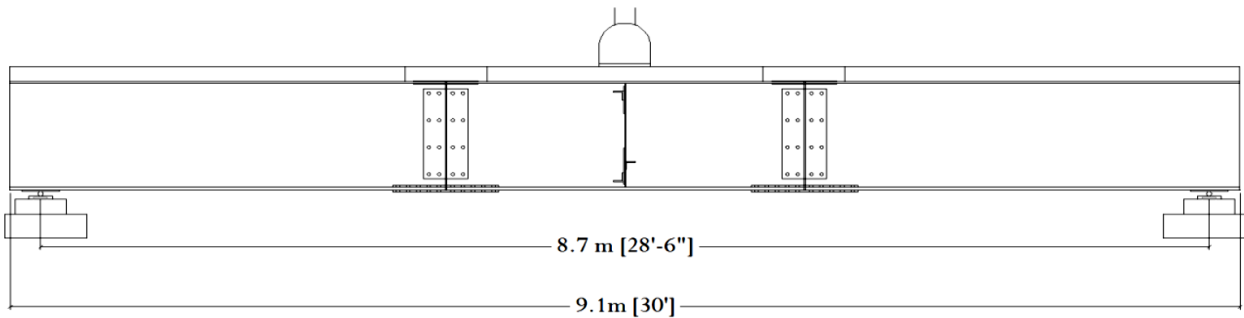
2: Girder span (Section A-A) and load application (Hartman et al (2013))
